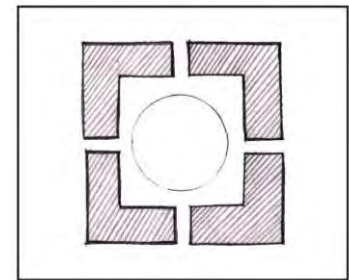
Open Space: Figure ground plan Shows Central space/ Courtyard act as a source of light
